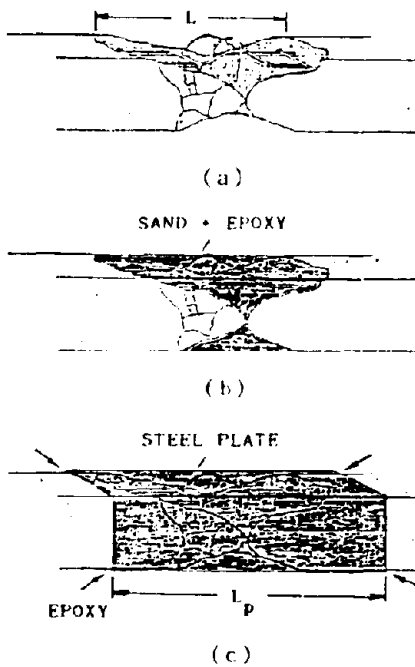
Steel plate covering method: (a) Damaged segment. ( $L$ : length of damaged segment) (b) Fill with sand and epoxy resin mixture. (c) Cap with a steel plate and bond with epoxy resin. ( $L_p$ : length of the steel plate)  $L_p=L$  for specimen 5.  $L_p=2L$  for specimens 1 and 10.
